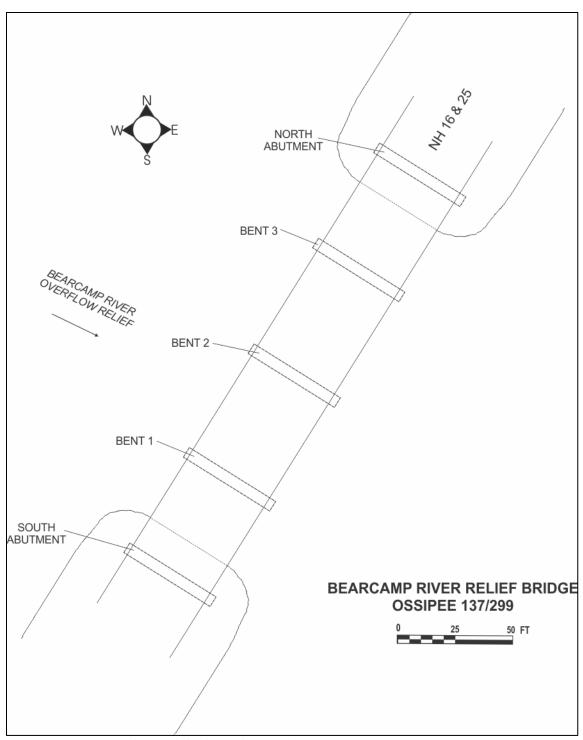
Bearcamp River Relief Bridge, Site Sketch
